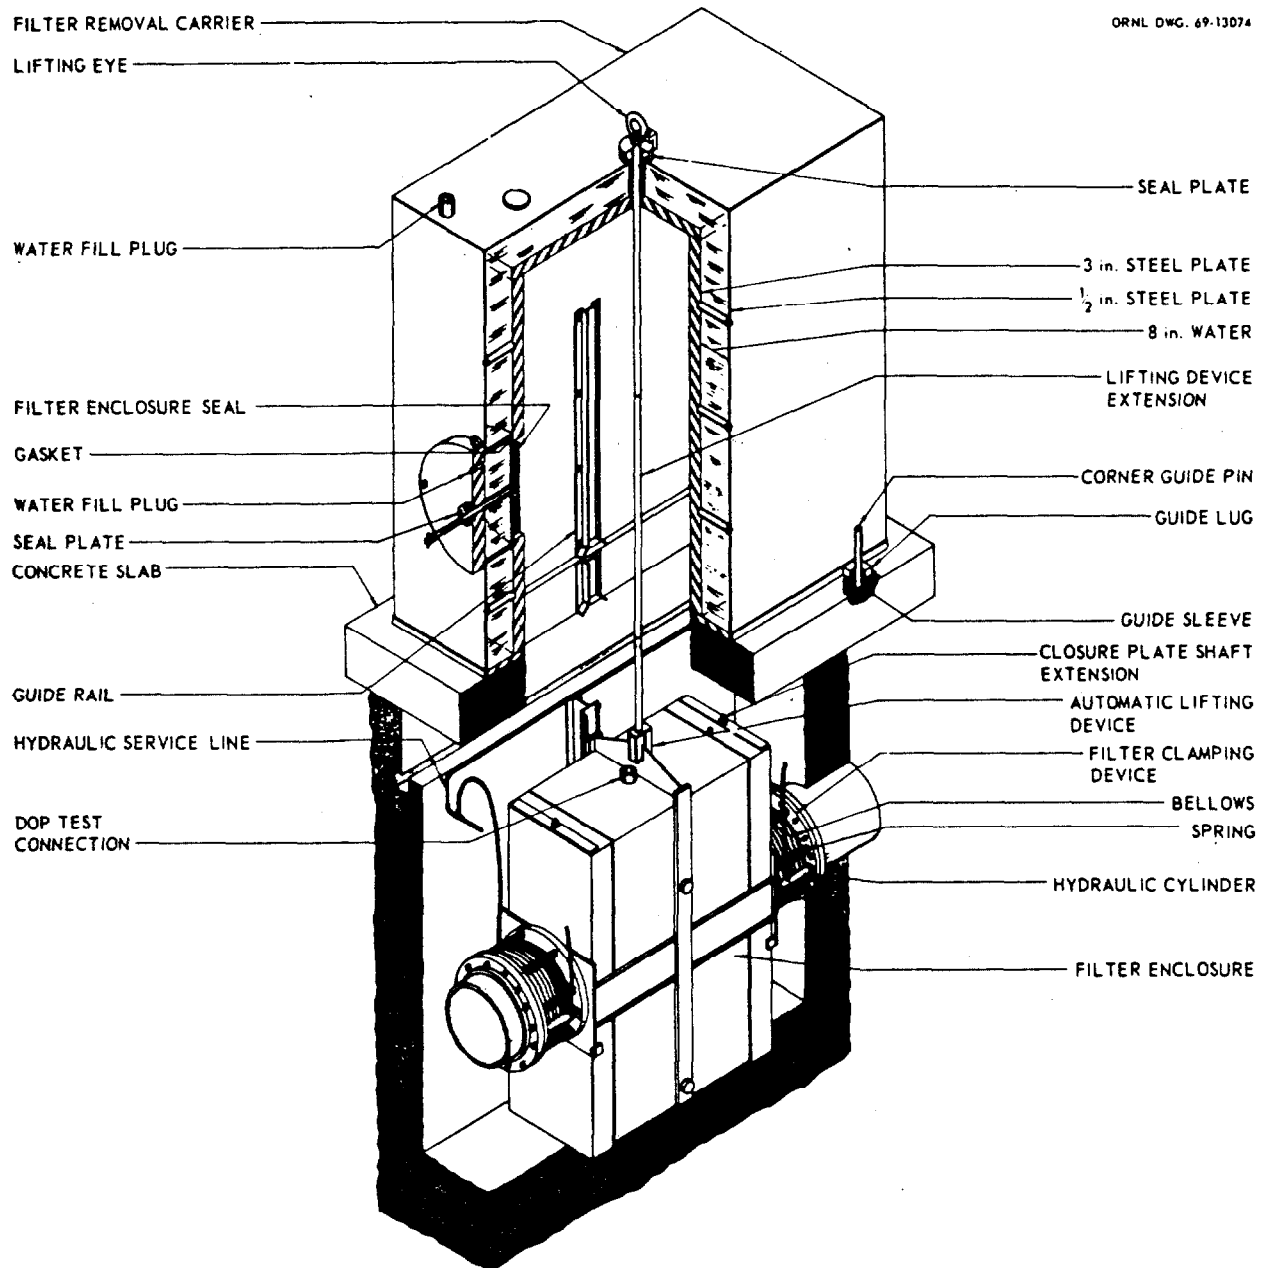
TURF remotely maintainable filter installation with carrier-cask positioned in preparation for removal.
